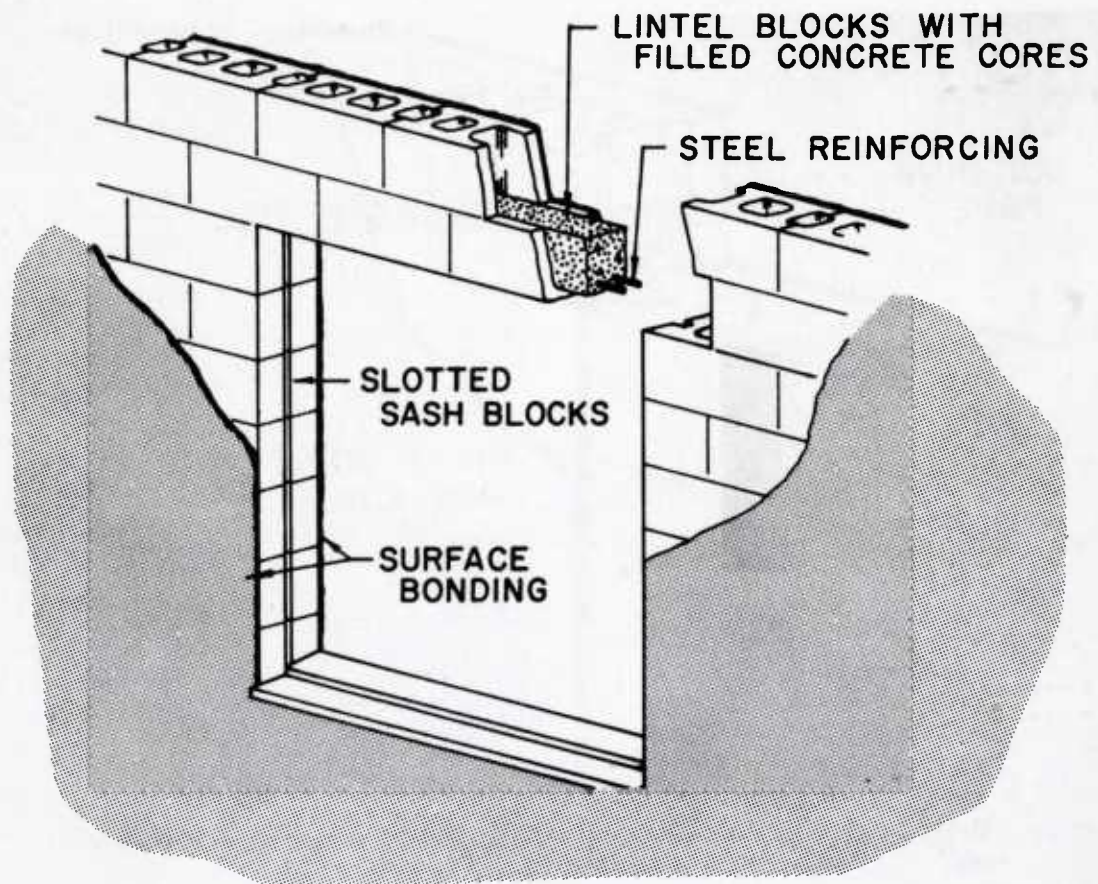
Lintel made from bond beam or lintel blocks. Provide with reinforcing bars and fill with concrete as shown.
